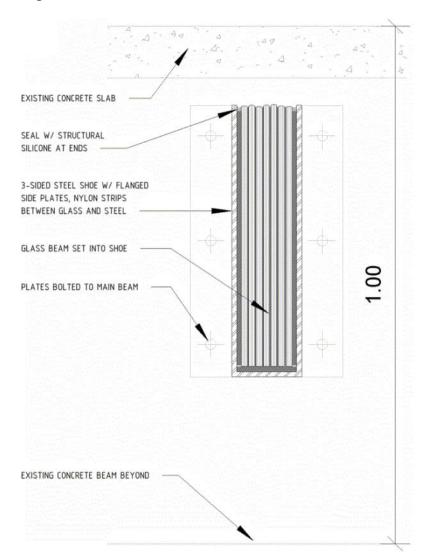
Section detail at end of glass beam to existing concrete beam
